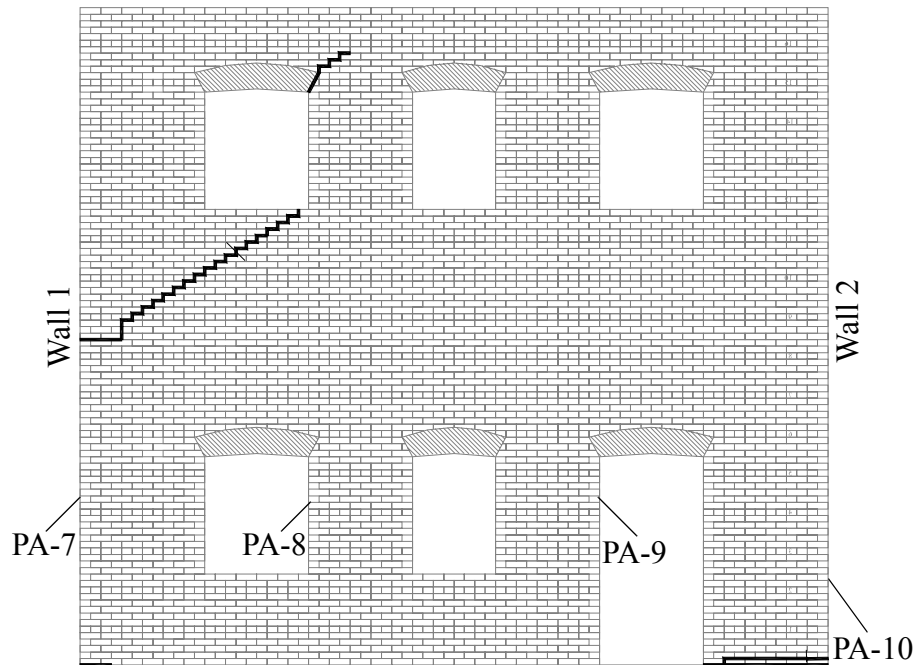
Crack pattern of Wall A following Test Run 10.
